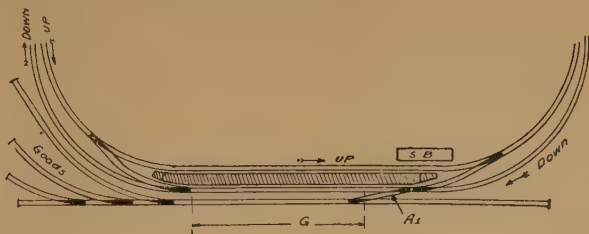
Alternative Details for Plan shown by Fig. 26
